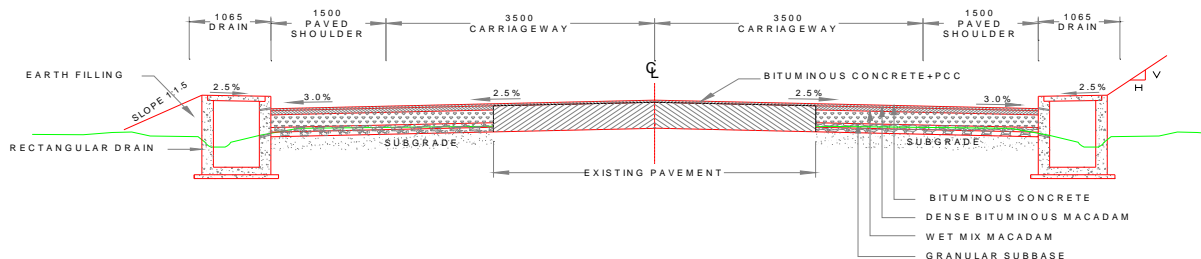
TYPICAL CROSS SECTION- TYPE-2
